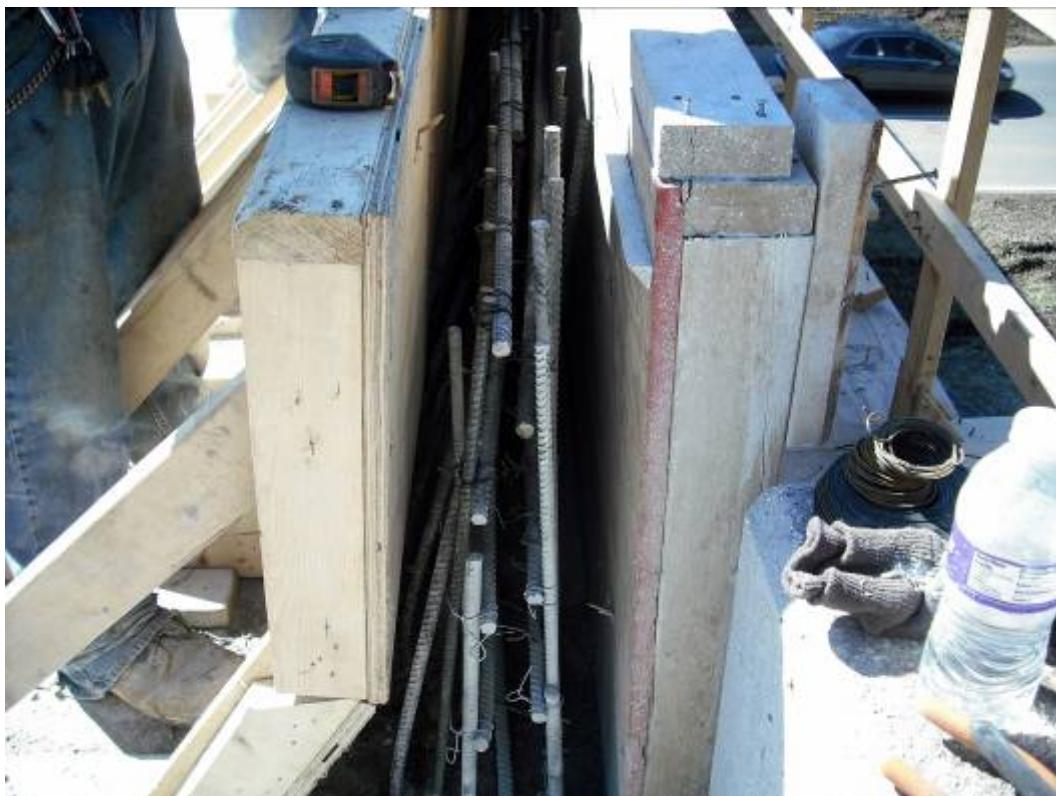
Cuts in barrier rail reinforcement steel for concrete expansion joint.
